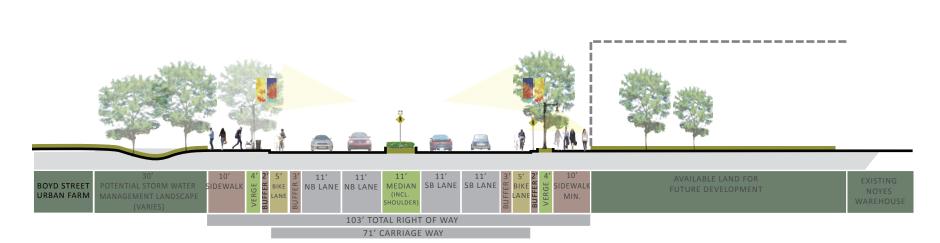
Section BB'Through Franklin Street Near Oxford St. Looking South
